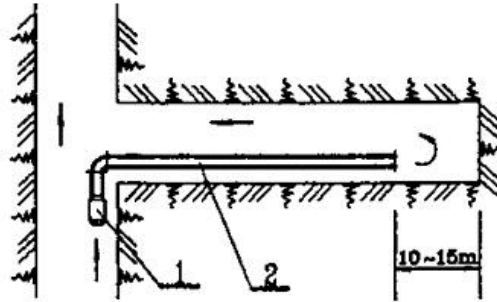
Blow type local fan ventilation system: 1. Fan; 2. Ventilation pipe line
